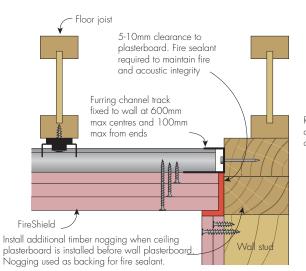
Fire Rated Ceiling to Wall – Alternate Detail Resilient mount and furring channel
